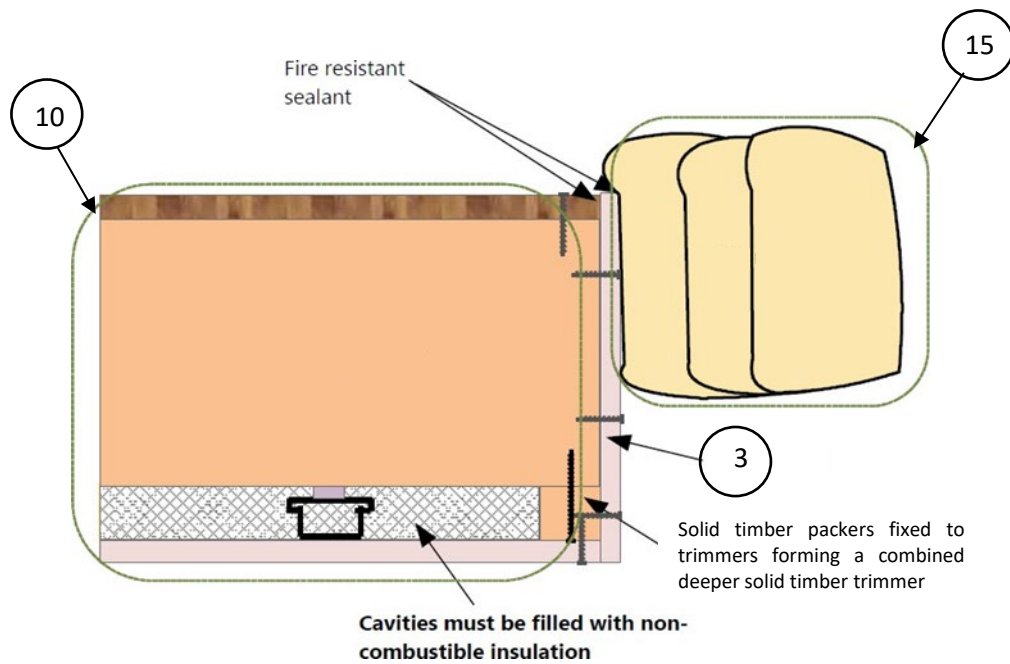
Pillows fitted to an opening in a massive timber floor – Section view
